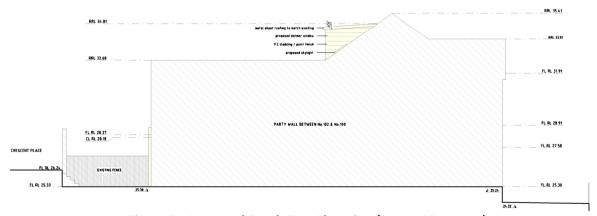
Proposed South East Elevation (D.A - 107 Issue A)
